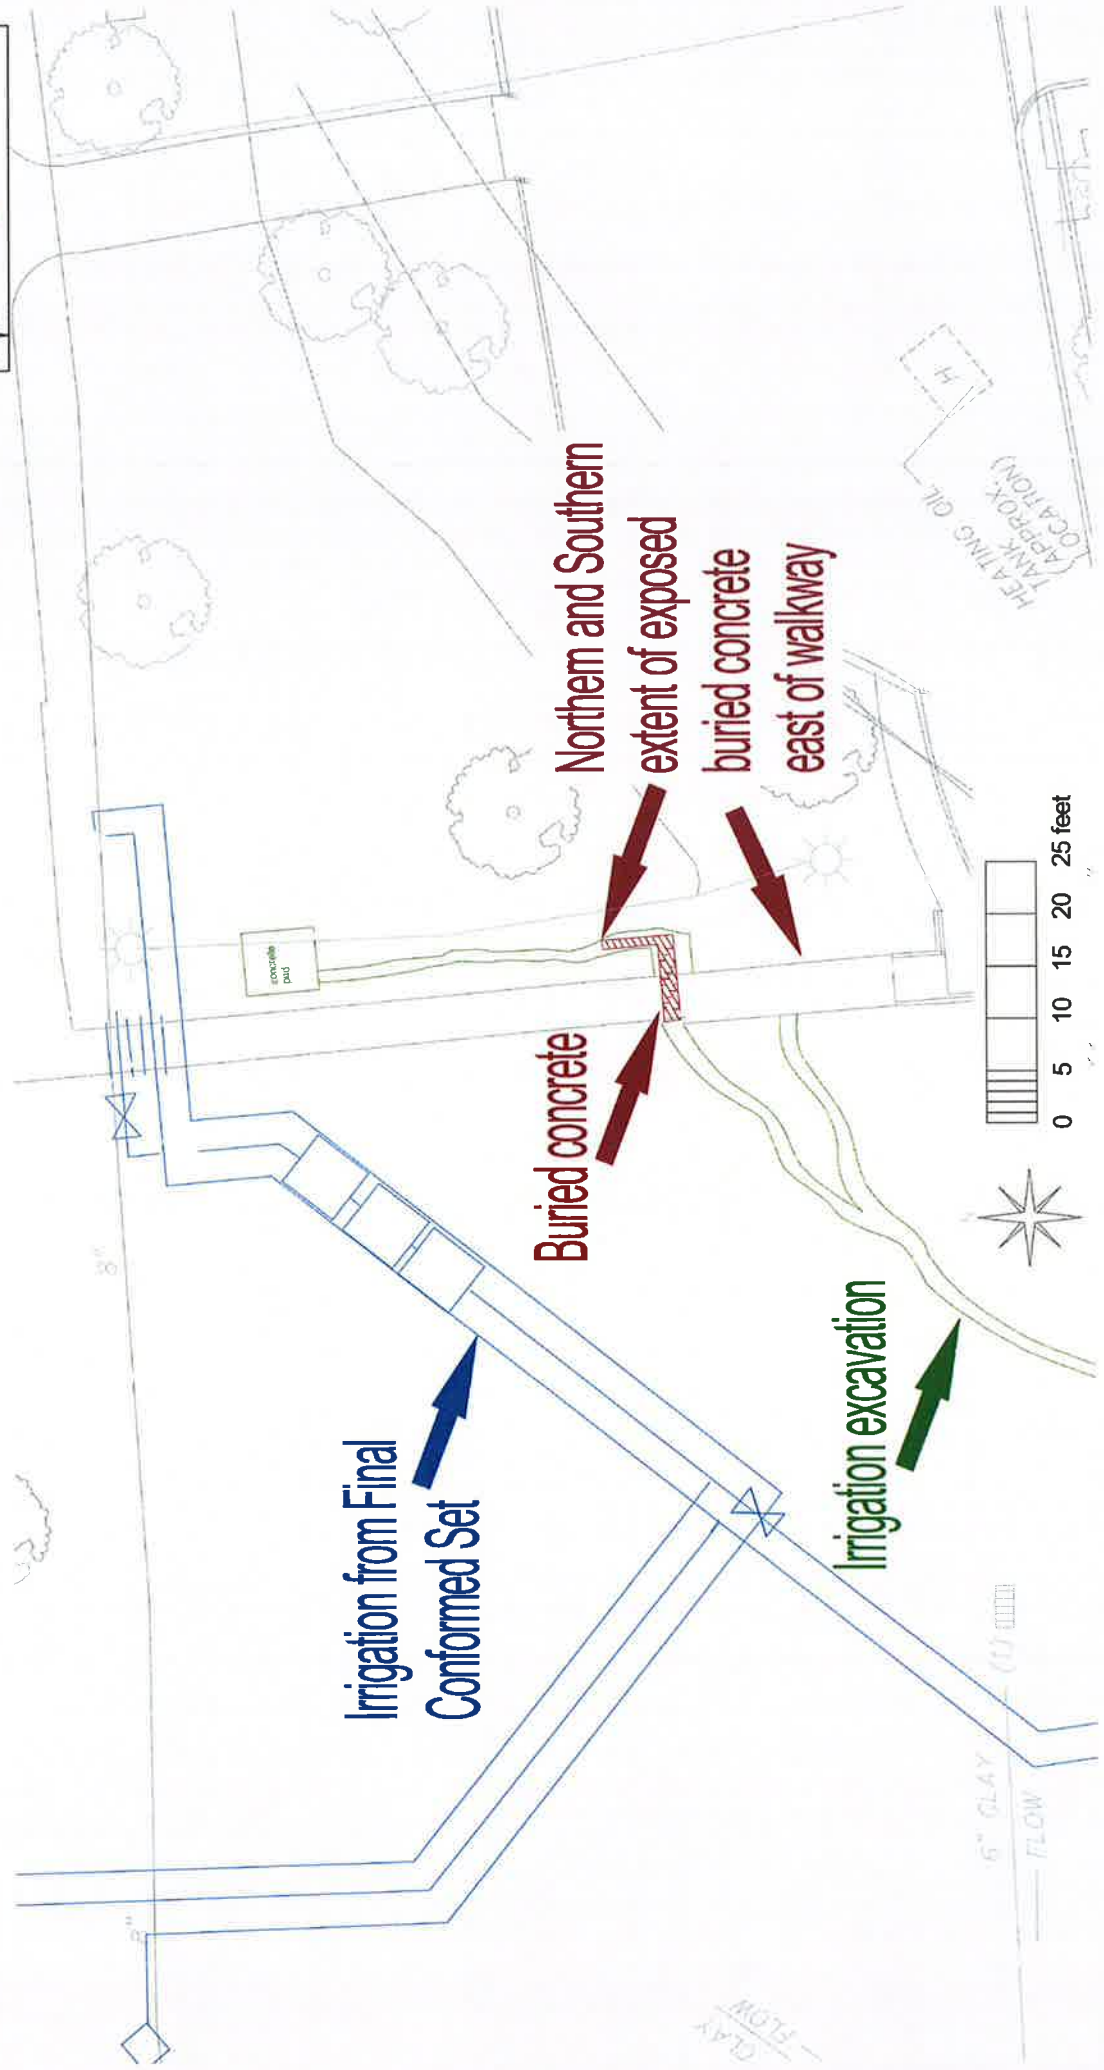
Plan view of the southern Parade Ground irrigation excavation showing the location of a buried concrete surface (South Battery, Tile 13).
